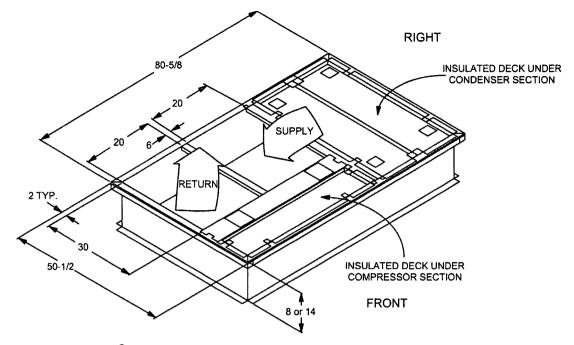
PREDATOR® ROOF CURB DIMENSIONS
